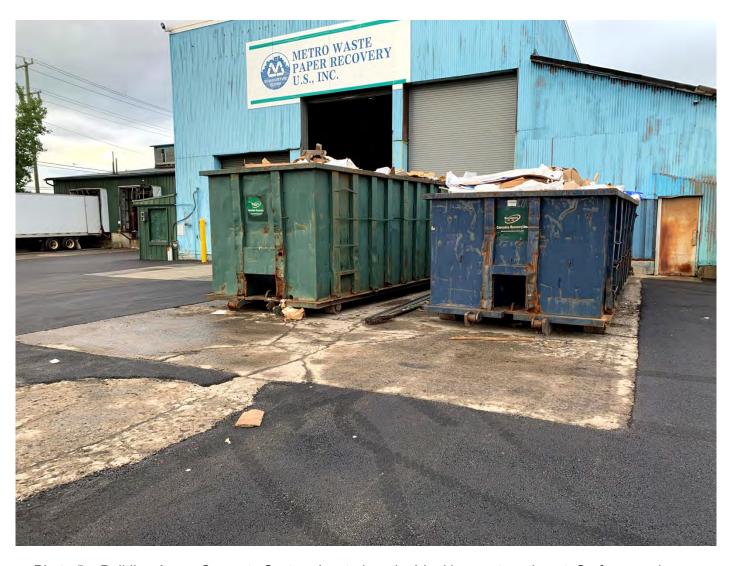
Building Apron Concrete System (central portion) looking east-northeast. Surface cracks are sealed.
